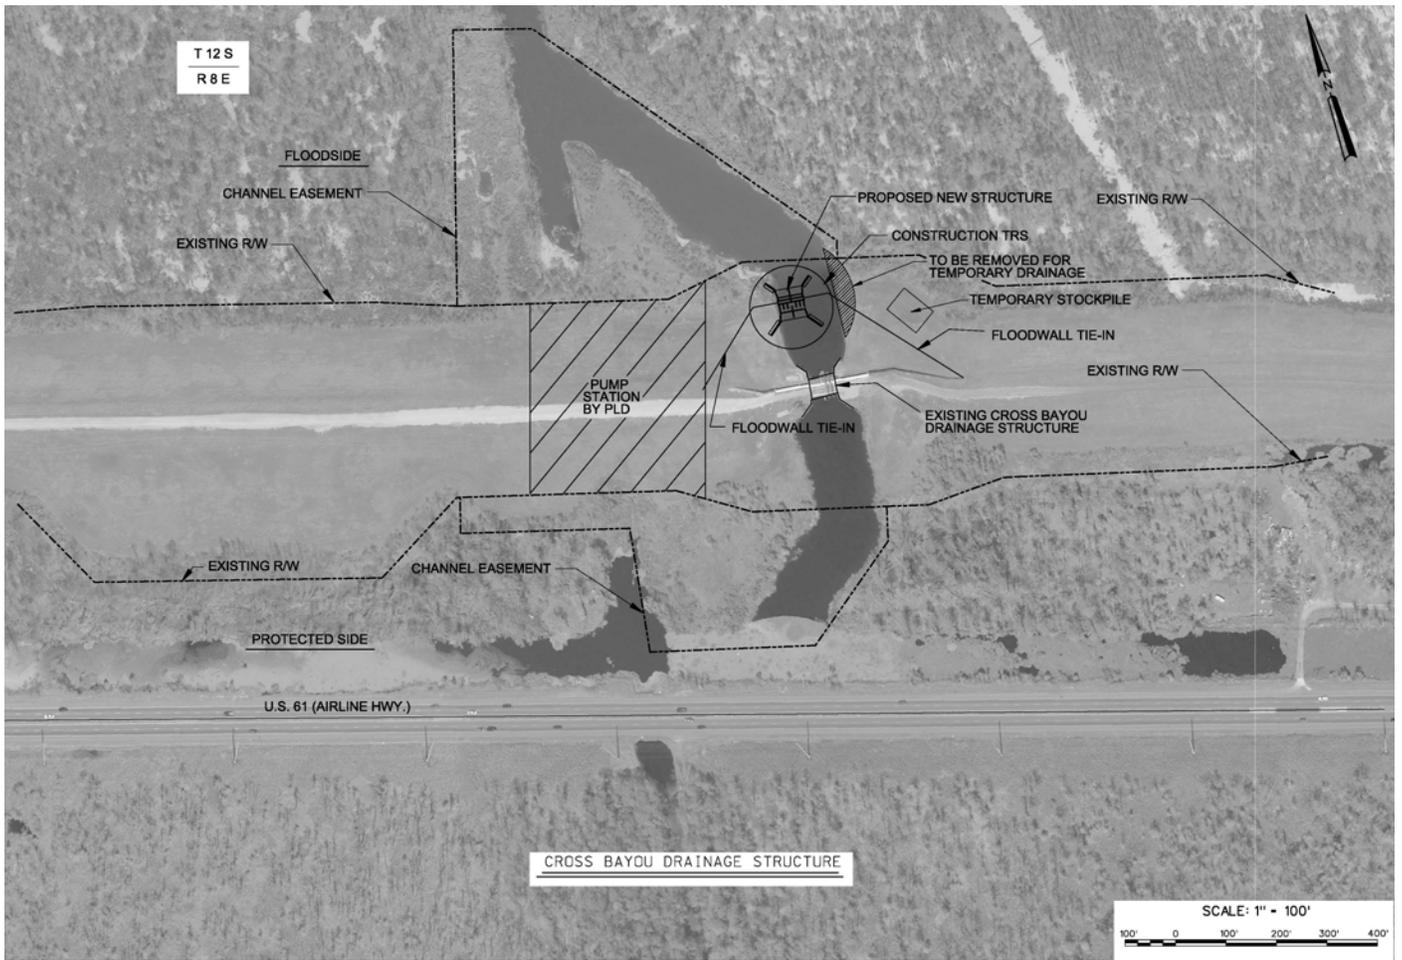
Overview of the proposed action plans for the Cross Bayou Drainage structure showing the proposed location of the drainage structure, temporary dredge and stockpile locations, and the Pontchartrain Levee District’s permitted pump station location.
